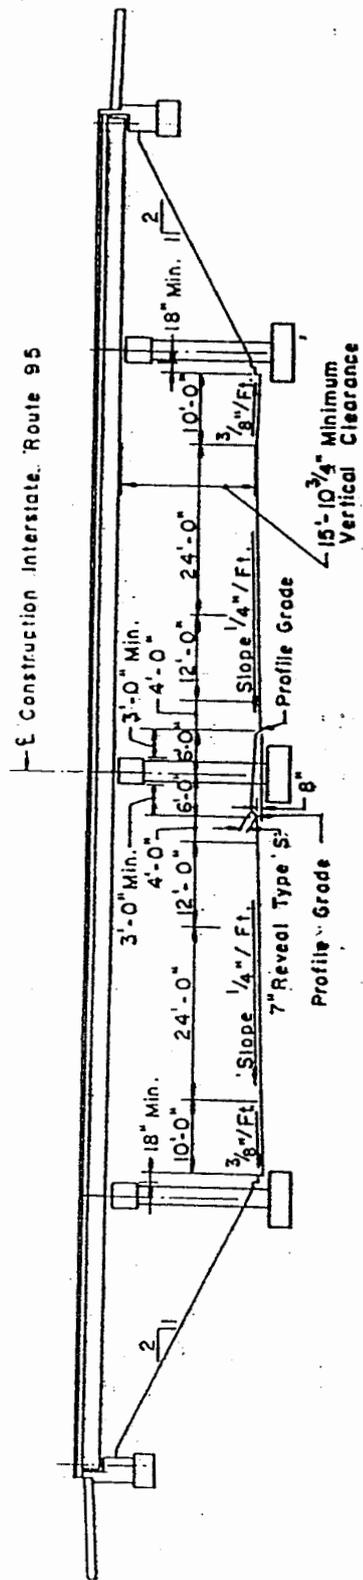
Pine Street Bridge #548: Bridge Plan
